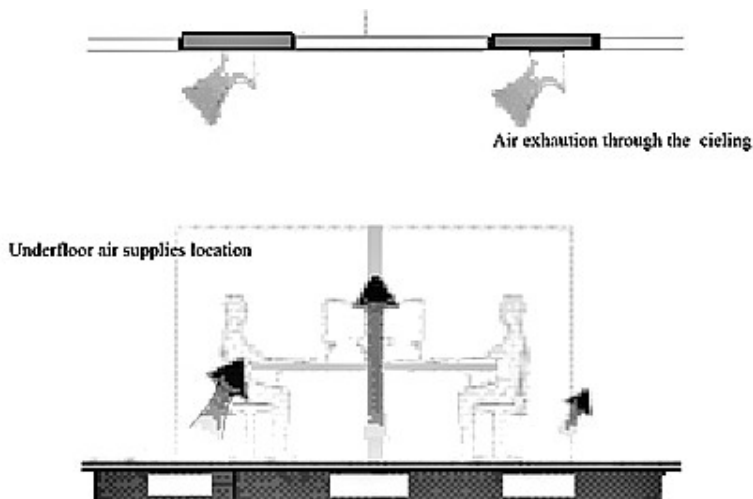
placement of under floor air distribution and exhaust in offices⁷⁹
